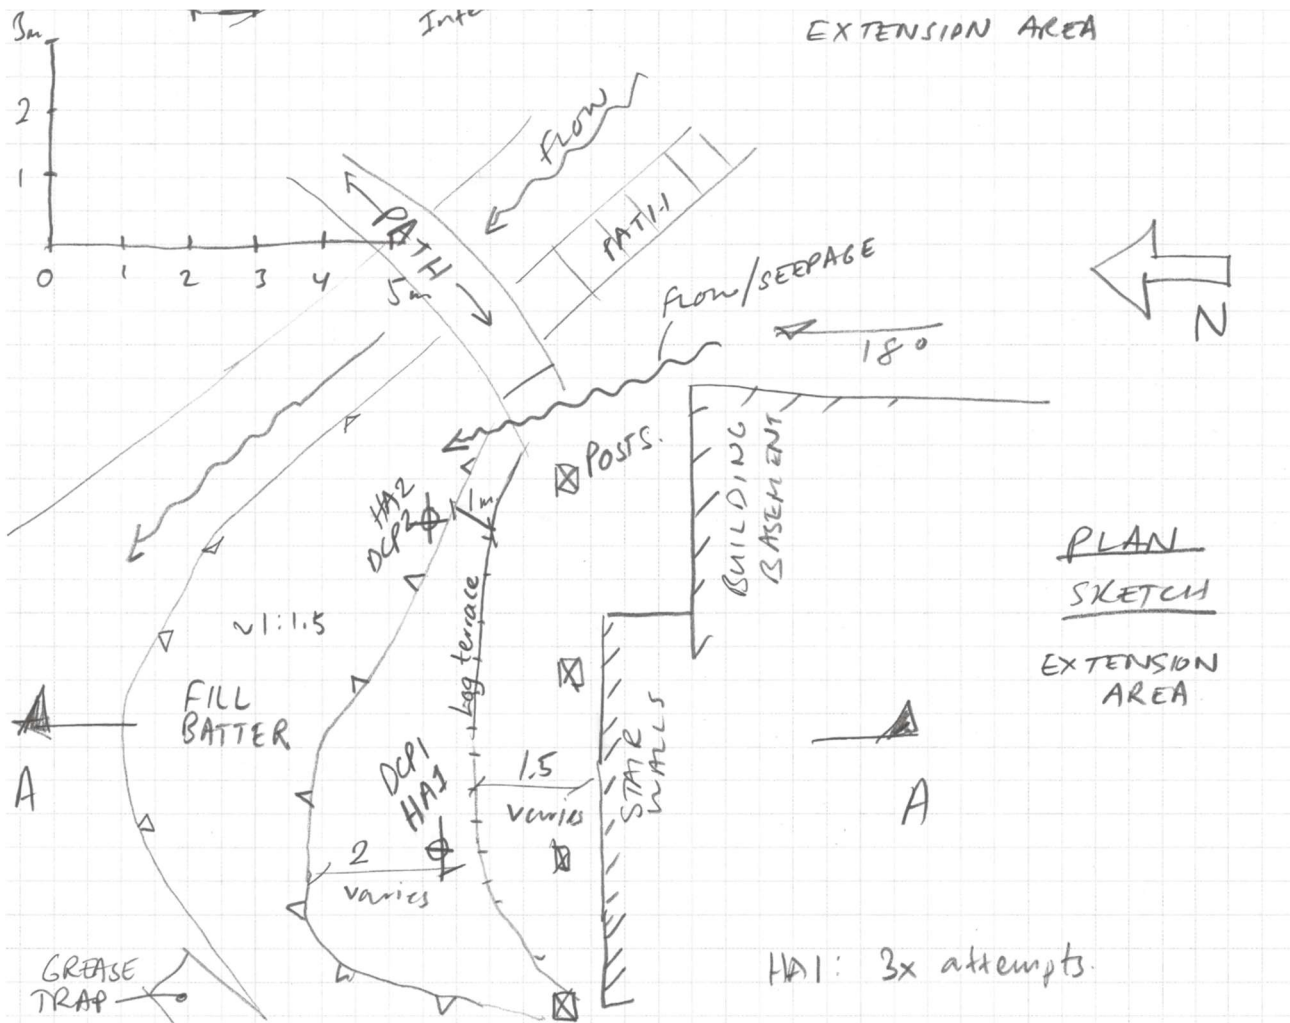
Plan field sketch of the extension area (existing conditions). Note fill wedge overlying colluvial soil. Note drainage and seepage observation at the east of the extension area.
